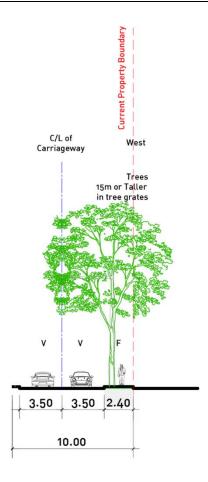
Indicative Southern Laneway cross sections
